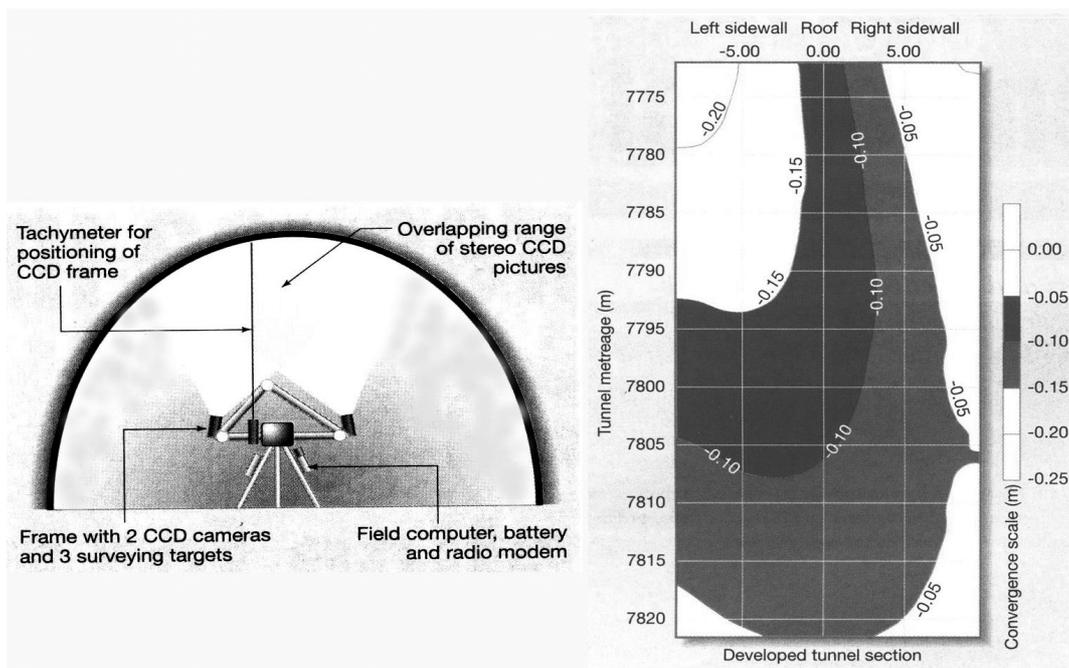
Typical features of the DIBIT tunnel profilometer (left) and typical plot of the measured wall convergence as contours on the developed tunnel wall area (Tunnels and Tunnelling, April 2001) .
